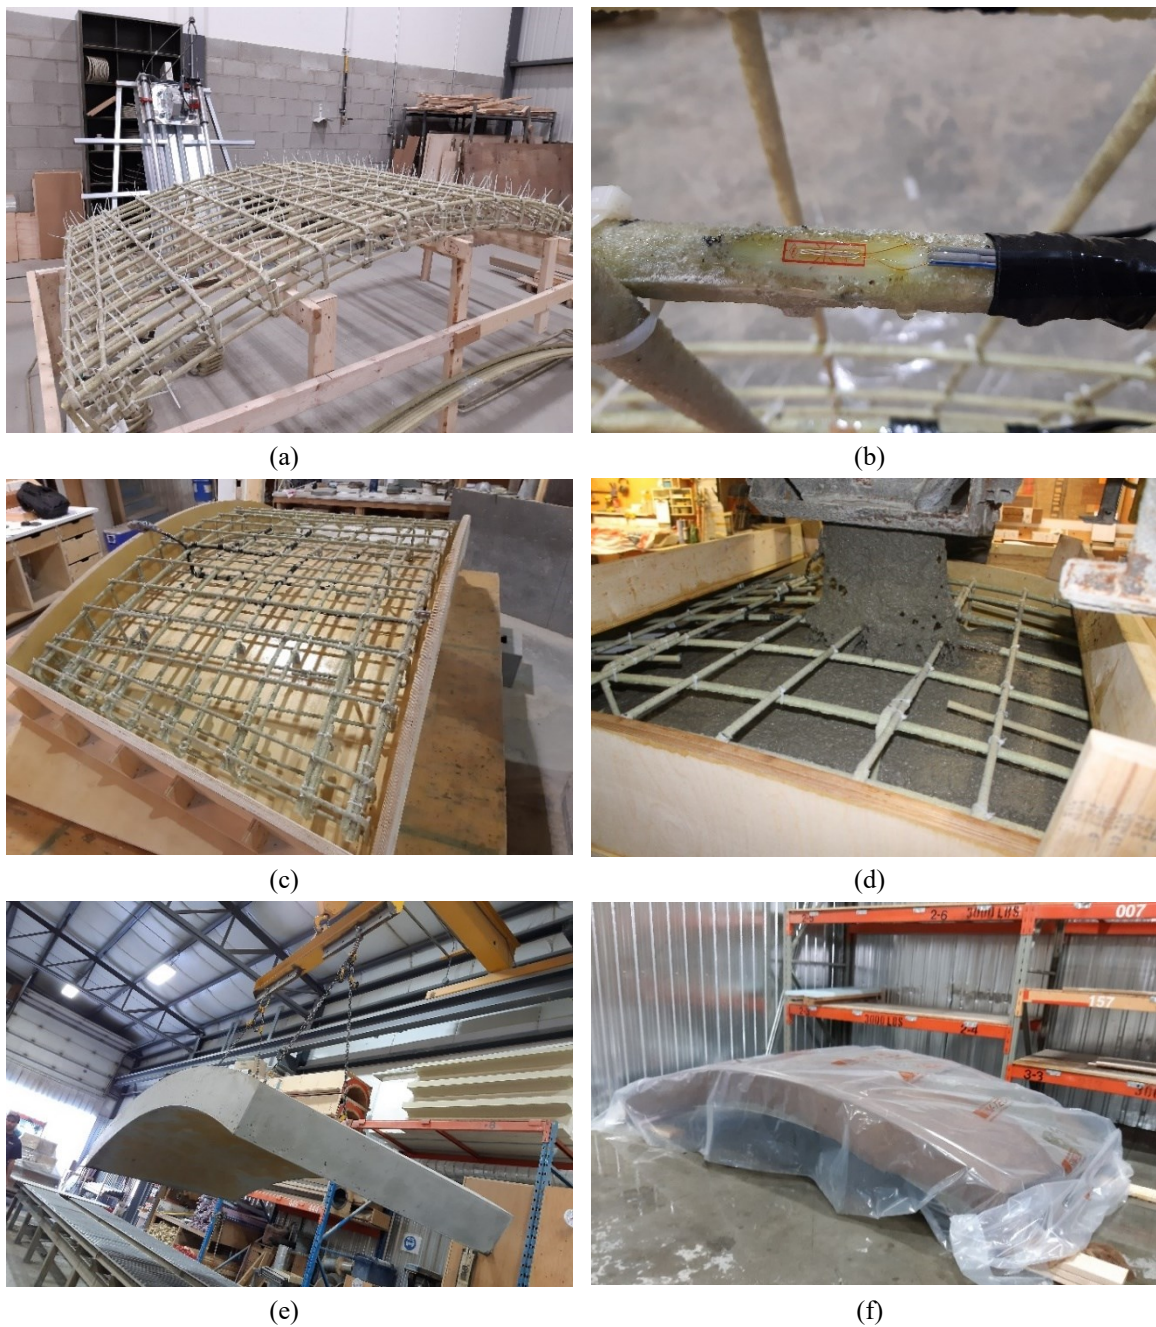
Casting and curing of specimens: (a) Cage assembling; (b) Installation of strain gauges; (c) Specimen before casting; (d) Specimen during casting; (e) Specimen after demoulding; (f) Specimen during curing.
